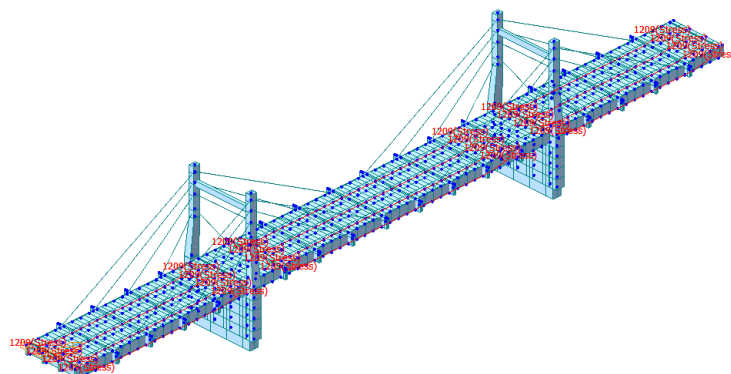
Finite element model of reinforced cable-stayed bridge
